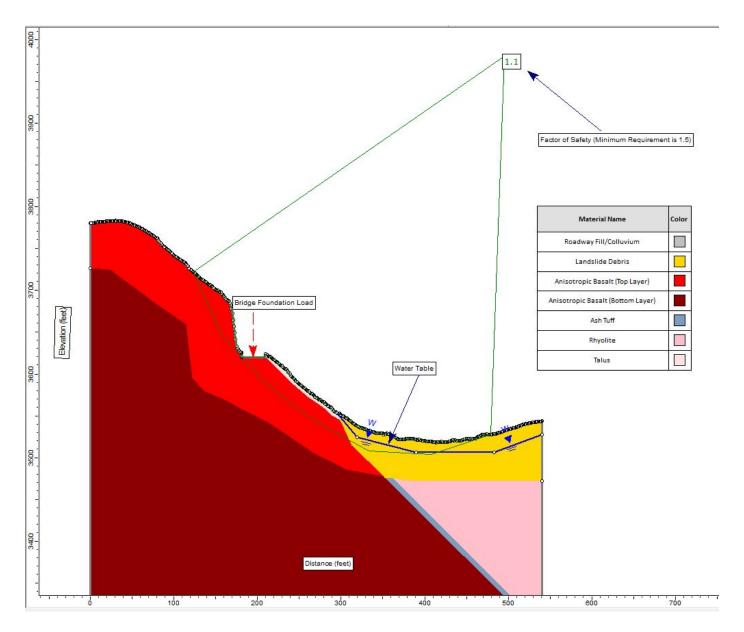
Slope stability analyses of the west abutment location with the adverse, low angle dipping basaltic rock discontinuity and approximate bridge loads.
